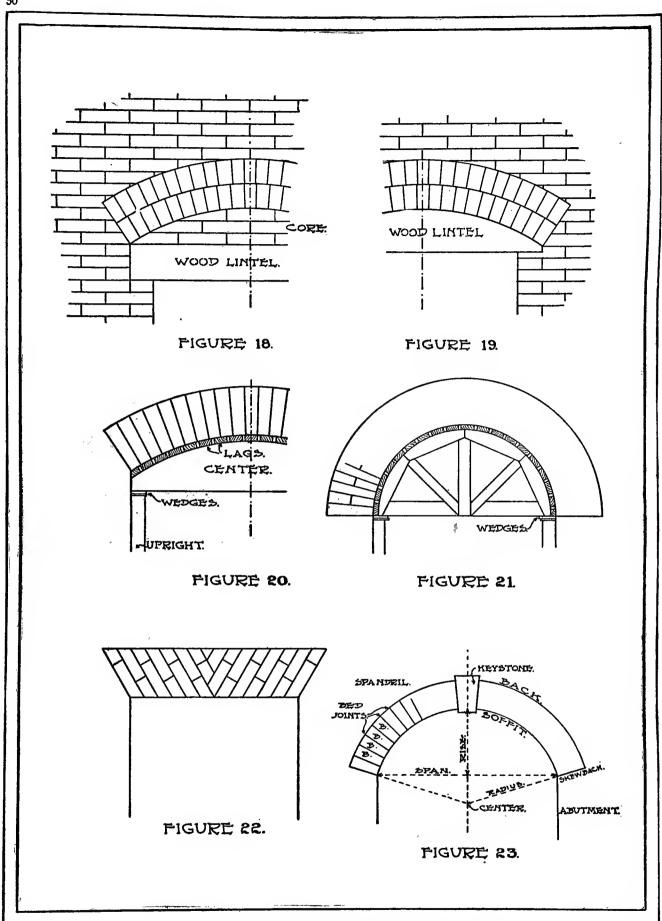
CONSTRUCTION OF BRICK ARCHES
